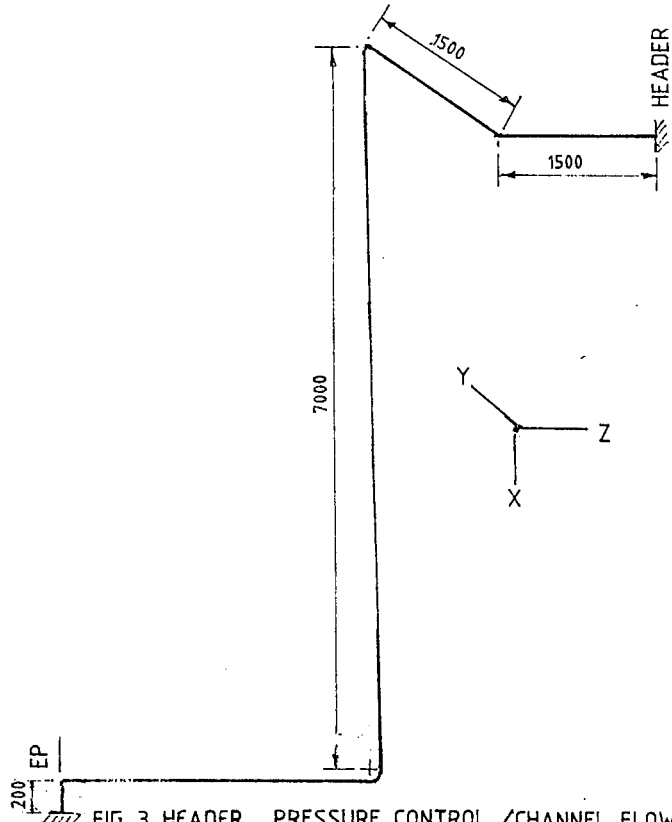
HEADER PRESSURE CONTROL /CHANNEL FLOW MONITORING TUBE LAYOUT-3 (FROM HEADER TO EPI)
